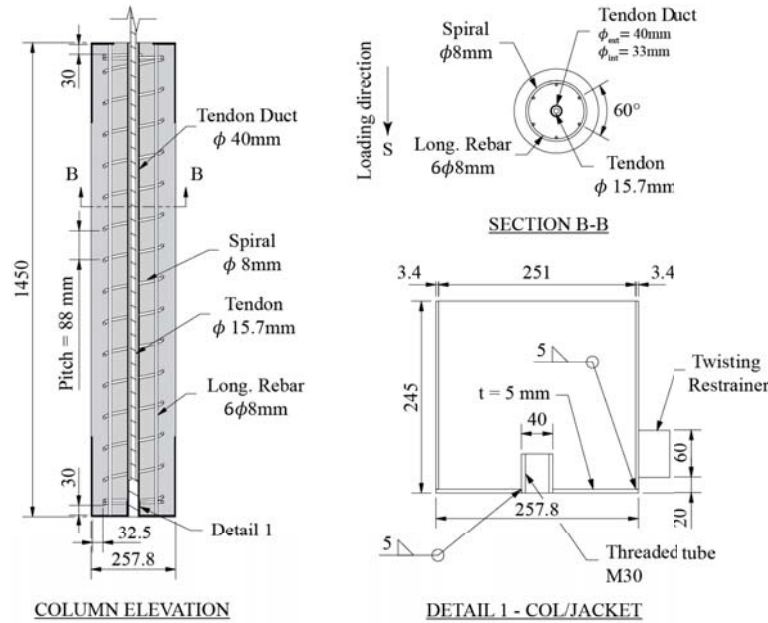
Column elevation and critical cross-sections (dimensions in mm)
